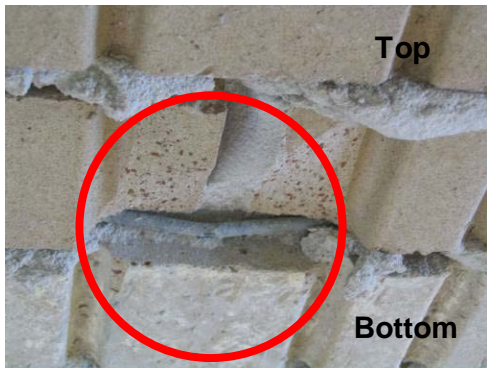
Pull-out of longitudinal wire followed by fracture of cross-wire at weld
